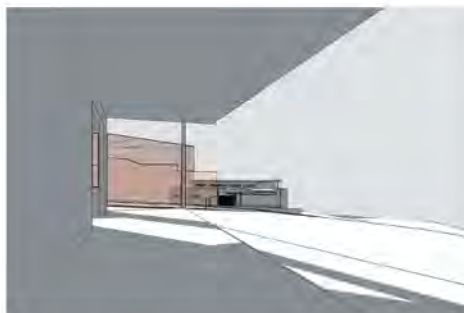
PERMITTED BUILDING ENVELOPE SHOWN IN PINK
